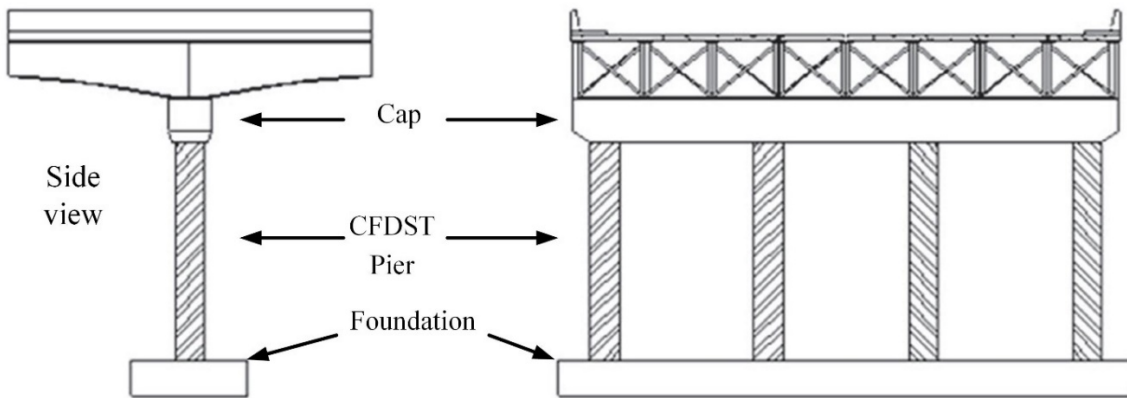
Multi-double skin composite bridge wall pier (83)
